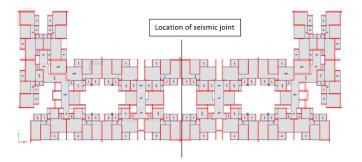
Model A: Plan of building with irregular configuration (U shape)
